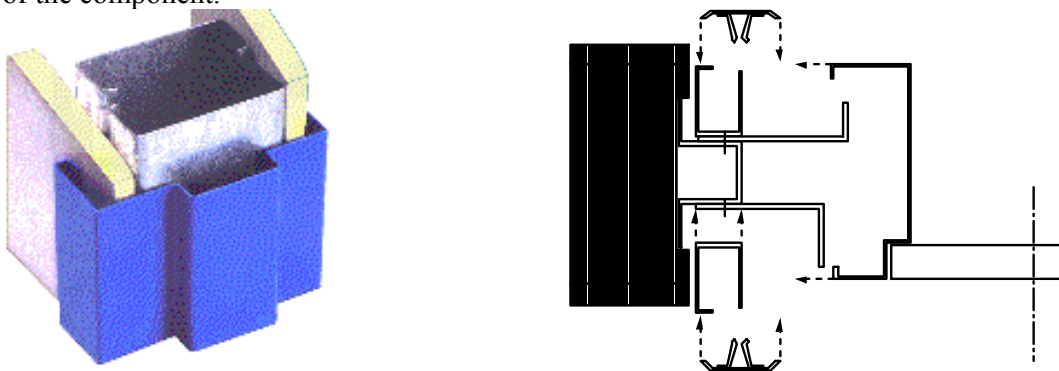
Left, conventional steel doorframe; Right, alternative for disassembly and re-use of steel frame
